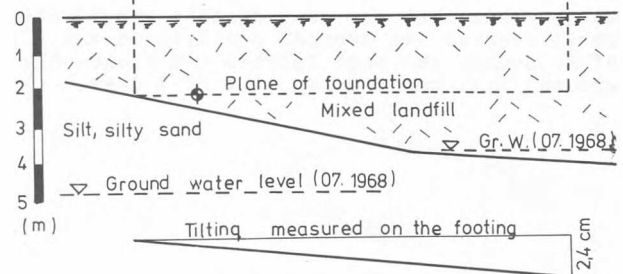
Tilting of a building as a consequence of water table elevation caused by public services
